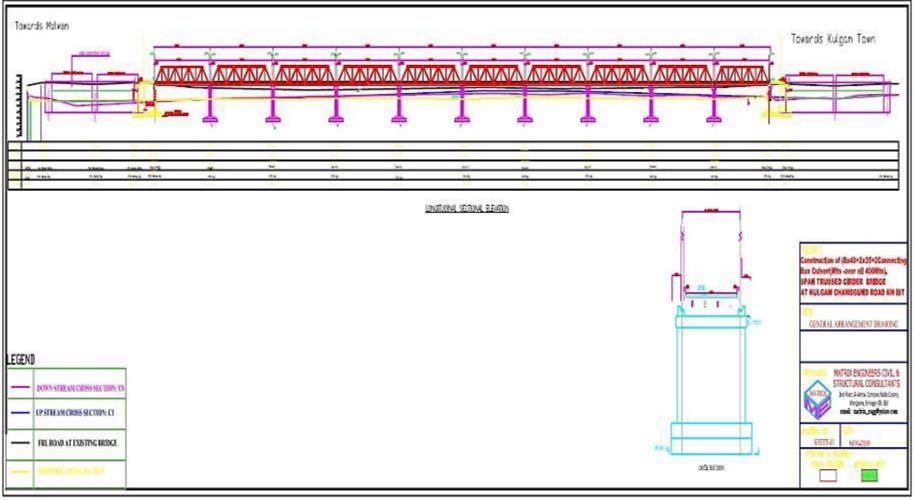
General Arrangement Drawing<br/>Vishav(GAD) of the Proposed Construction 400 meter Span<br/>Kulgam-ChambgundTruss Girder Bridge over<br/>DistrictVishavNallahatKulgam-ChambgundRoadinDistrictKulgam
